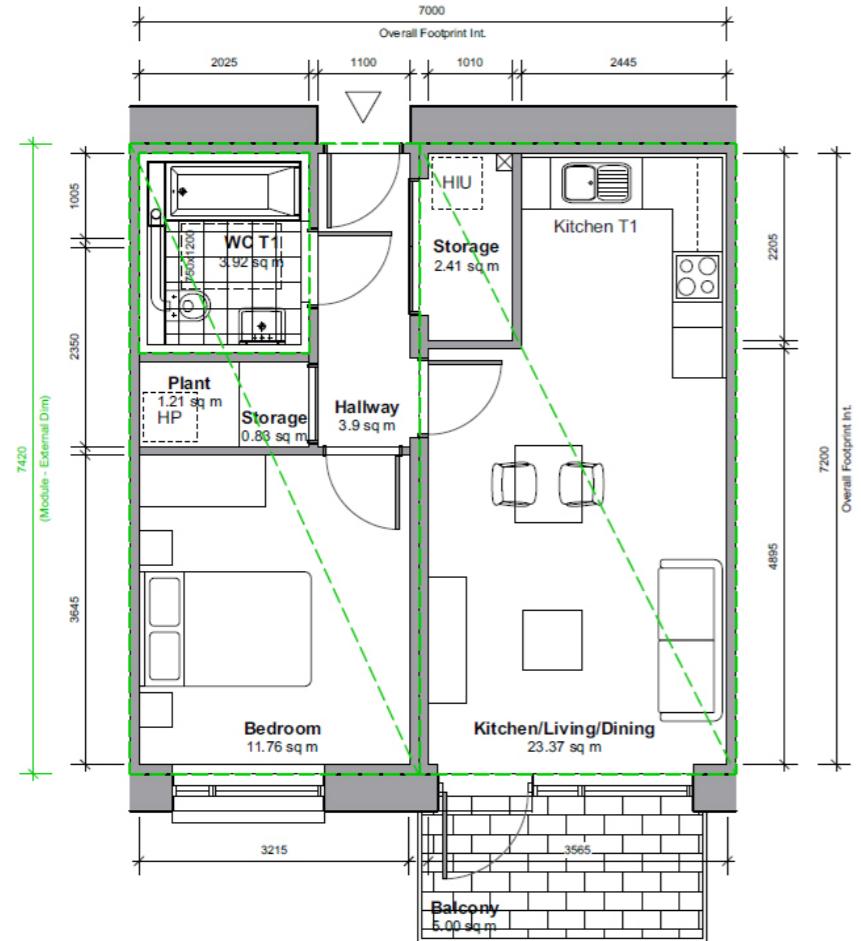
Apartment Type A-1B2P-1 One Bedroom Apartment
